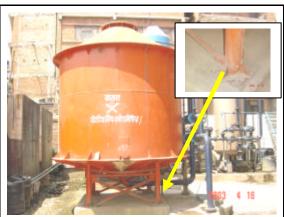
Water treatment tank which has a provision for bolting at the base but was found not bolted.
